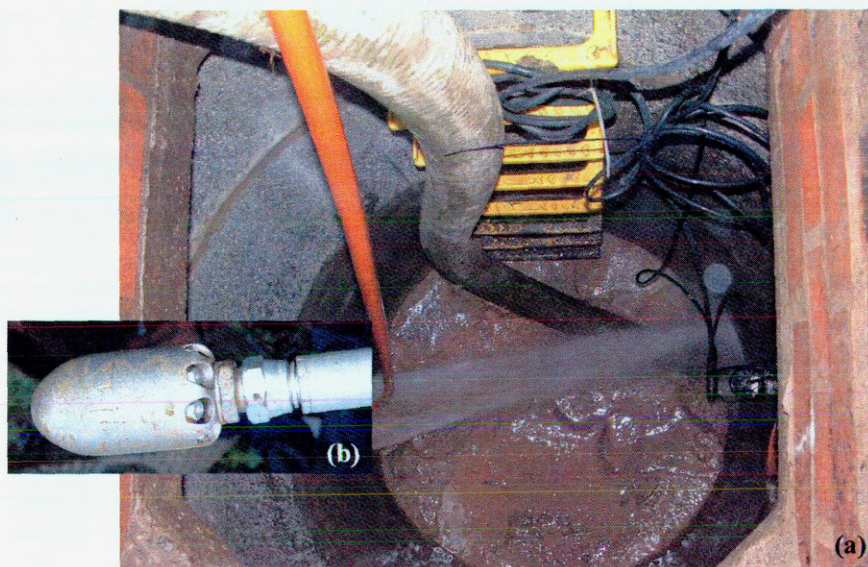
Cleanout of chamber at Walker Dam (a); High pressure head (b)
